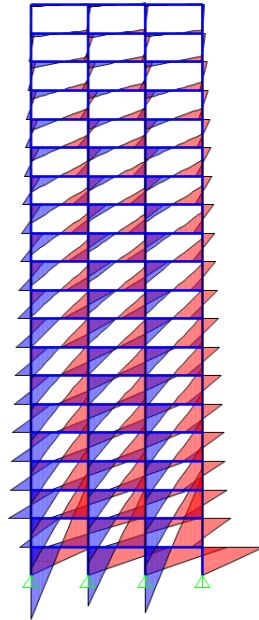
Responding forces of a shear wall with opening (Ching, Onouye, & Zuberbuhler, 2009)
